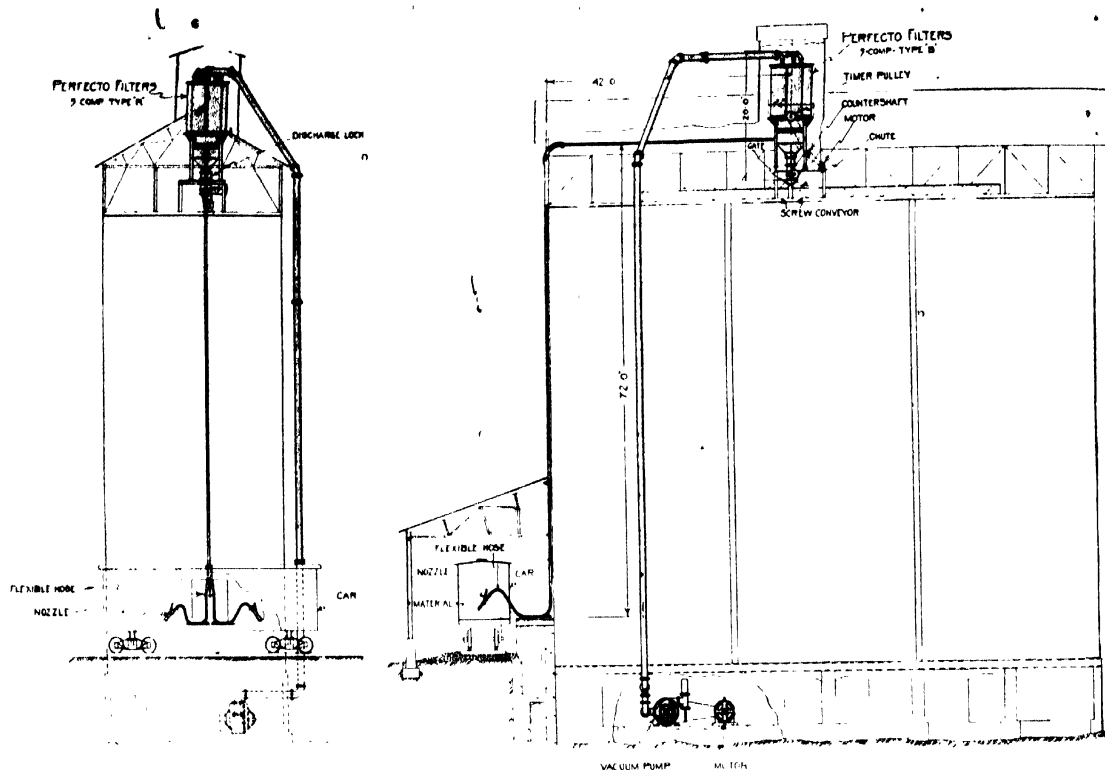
LANTHANITE HANDLING SYSTEM LAYOUT
